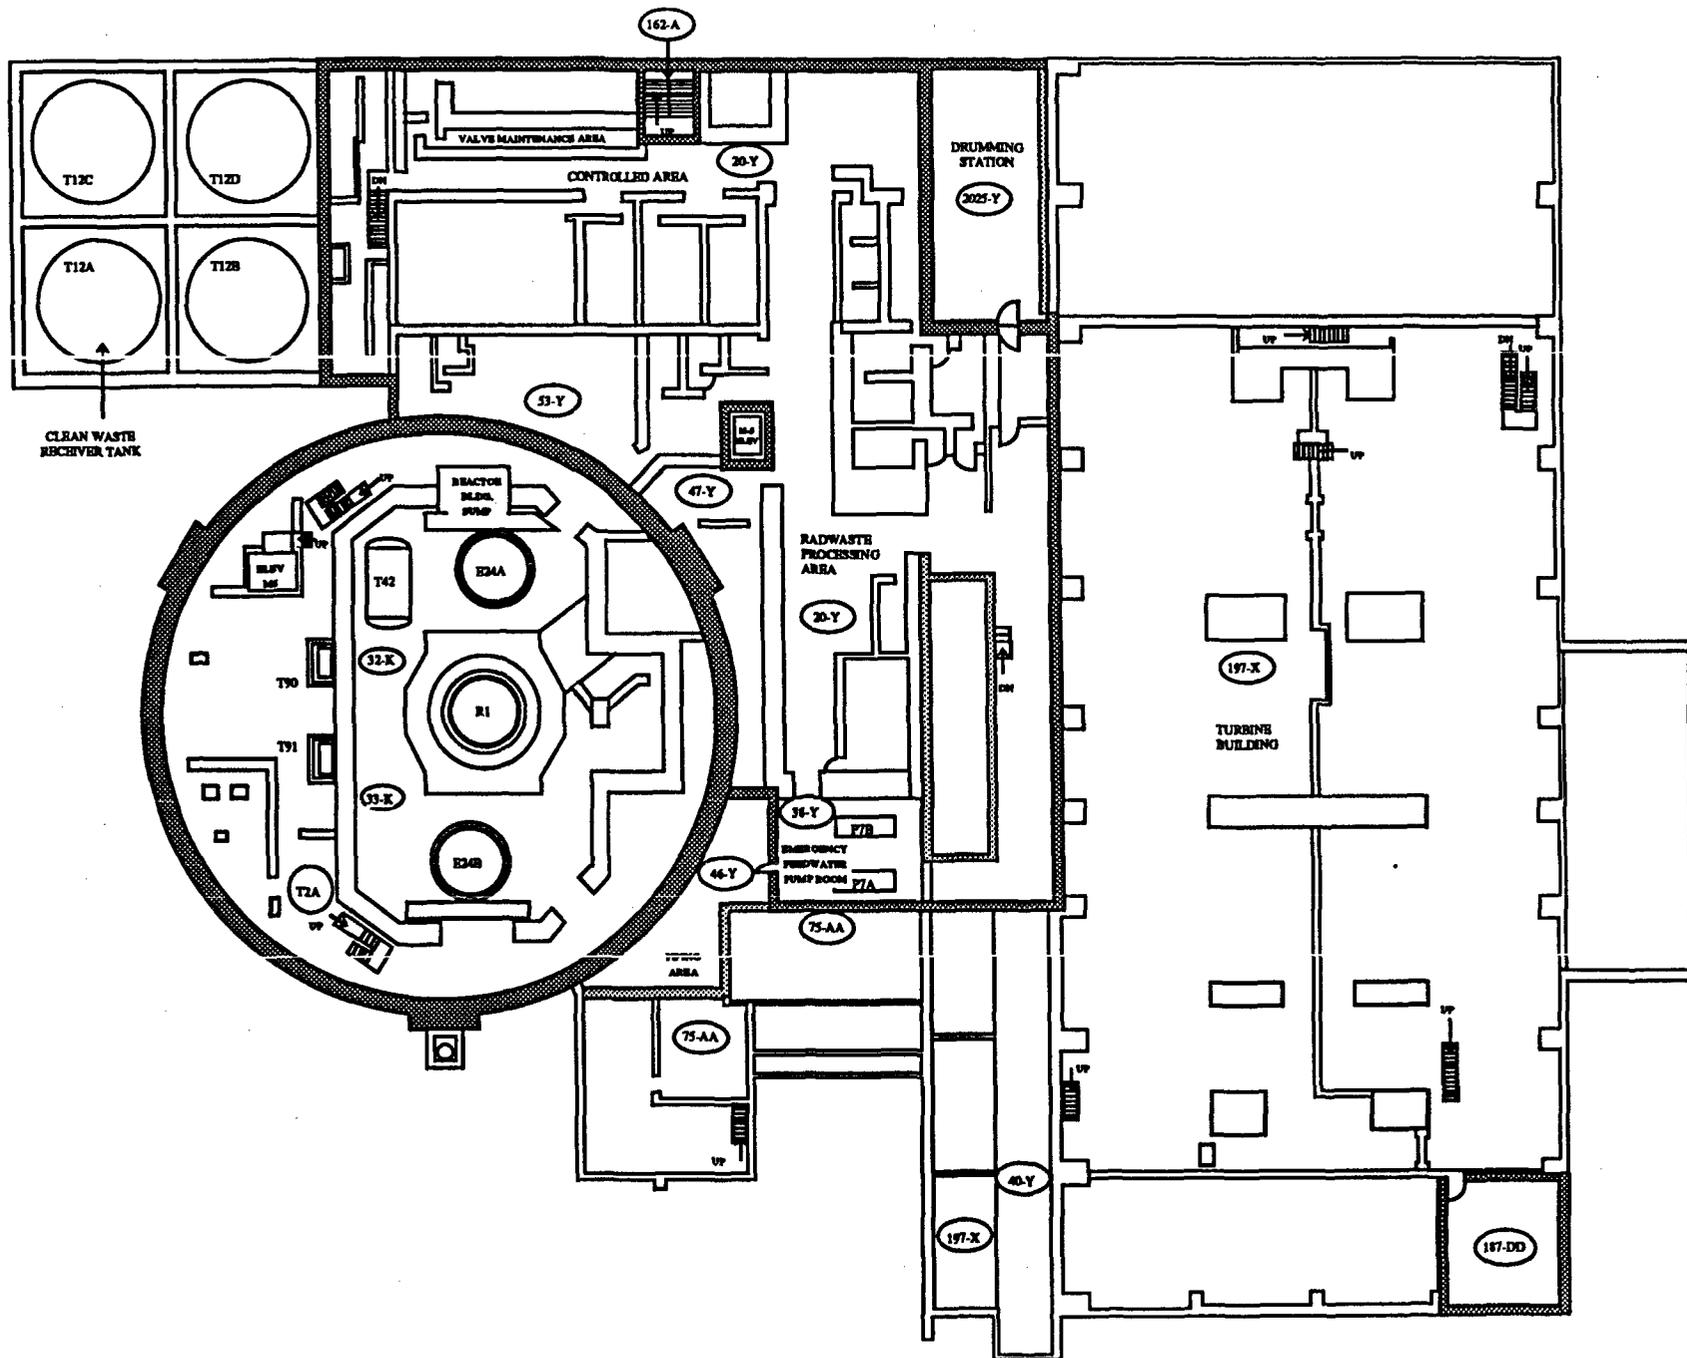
FIRE ZONES ON ELEVATION 335'
